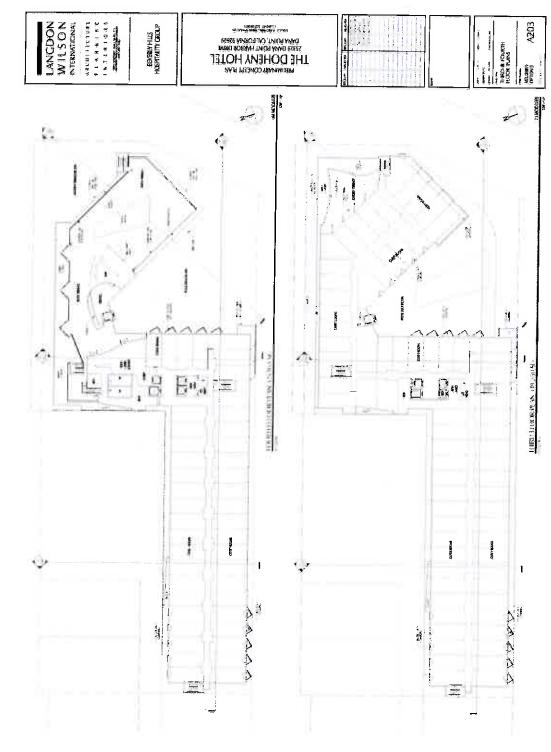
THIRD AND FOURTH FLOOR PLANS
